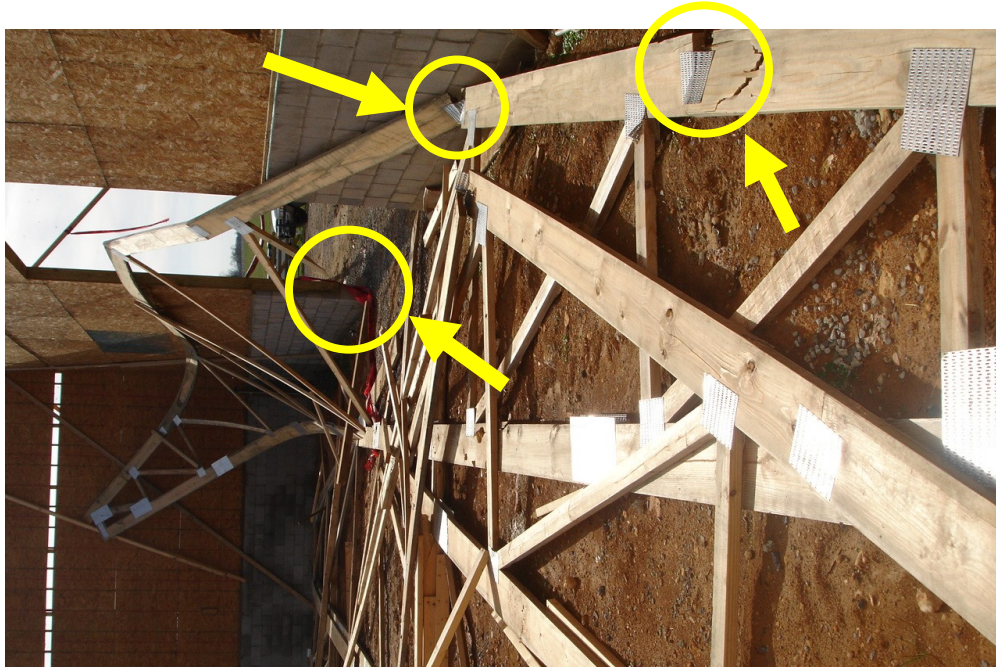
Truss 2 (T01-1): areas of significant damage
